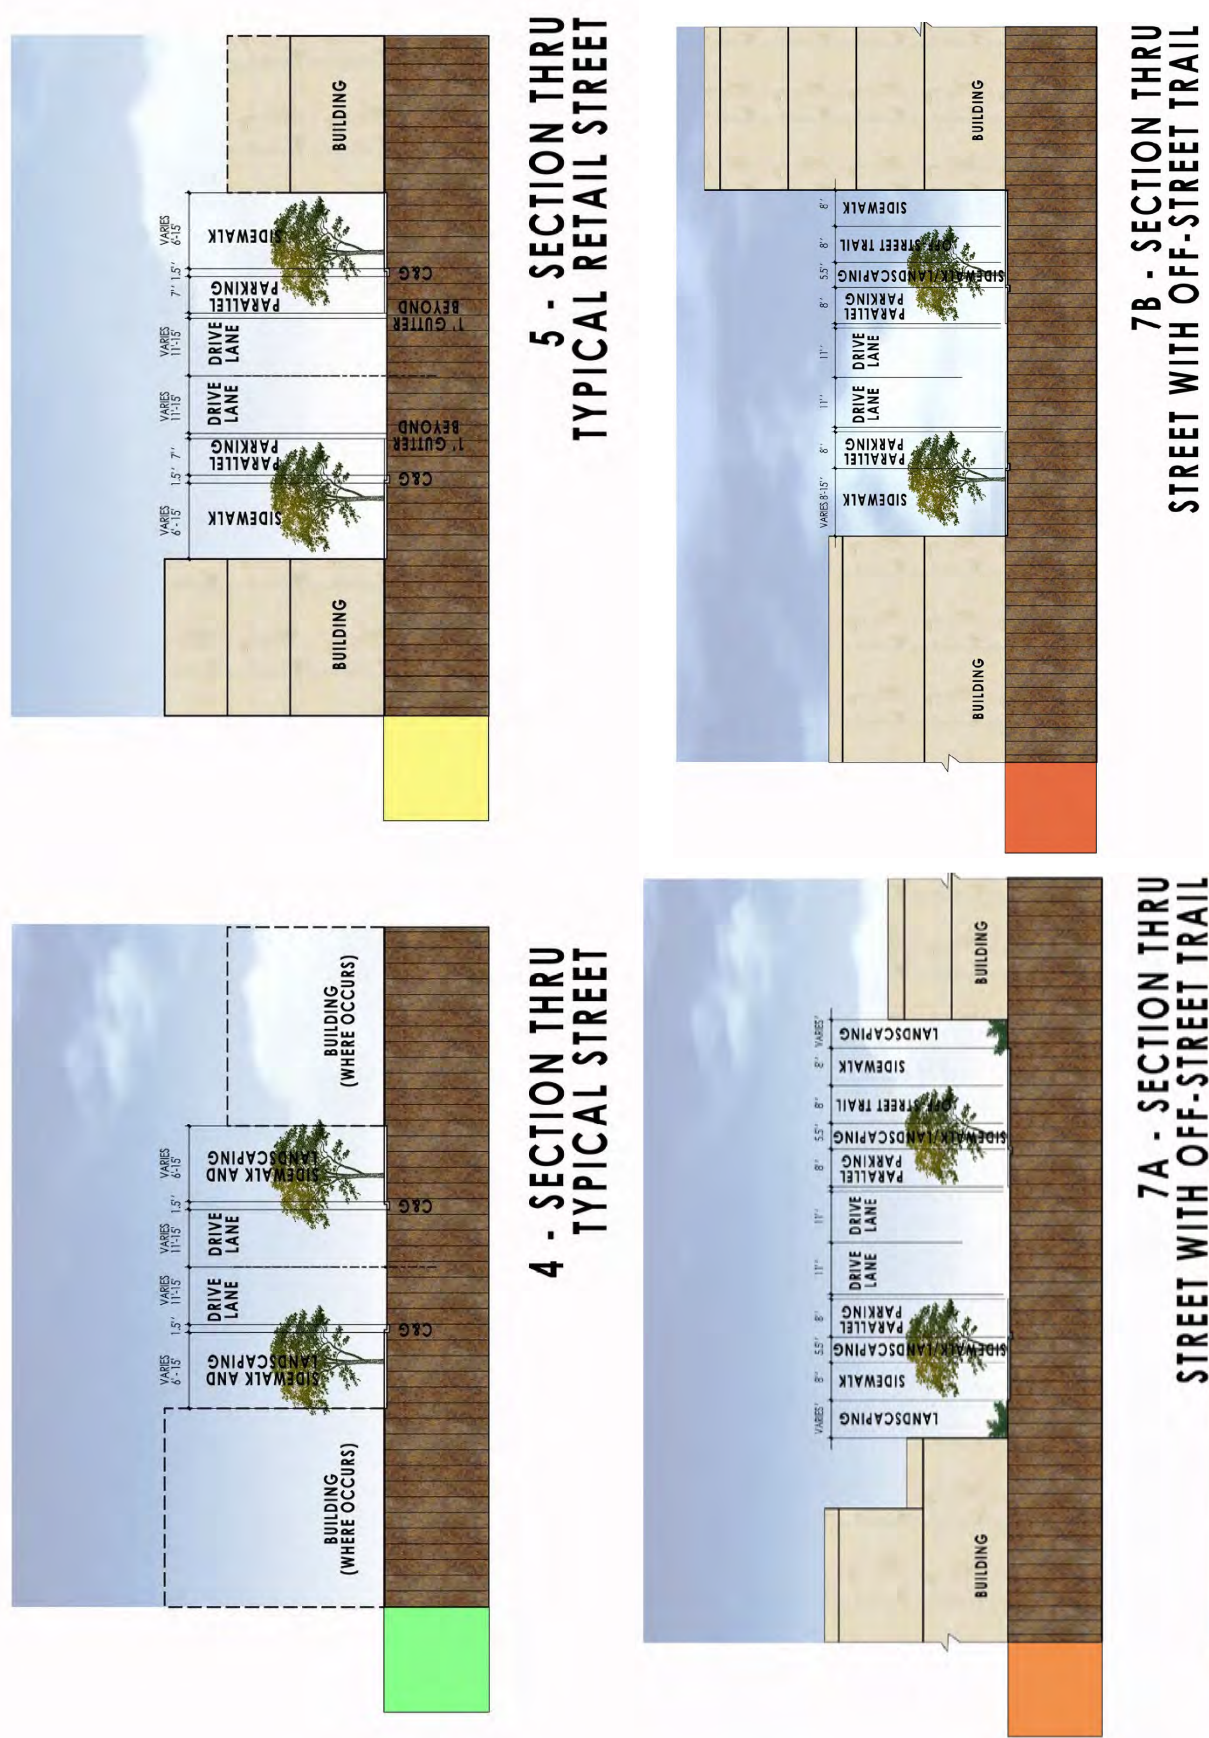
EXHIBIT F: CENTRAL ROAD TYPE (SECTIONS)
